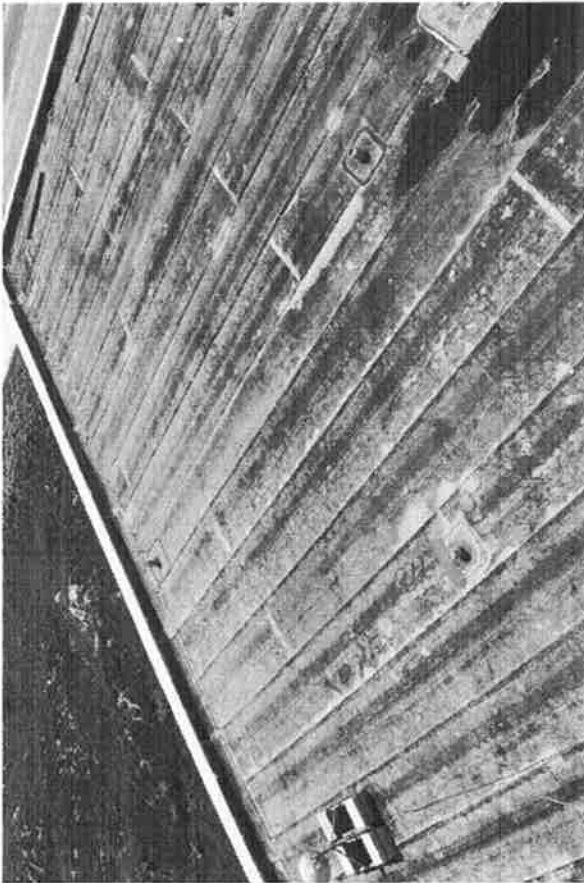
View of aged and deteriorated mod-bit roofing (typical)
